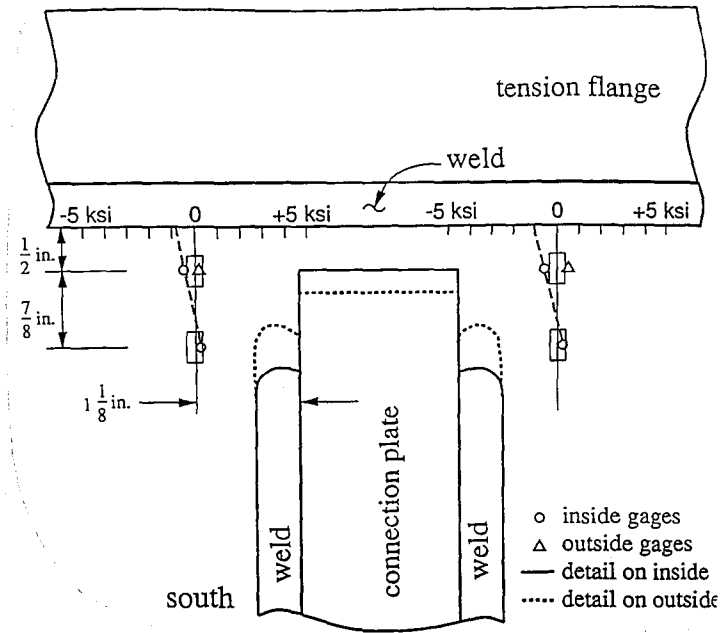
Static Stress Distribution on Outside Girder at Pier S7-9 (96 in. Girder) After Retrofit with Dump Truck in Outside Lane (Worst Case)
